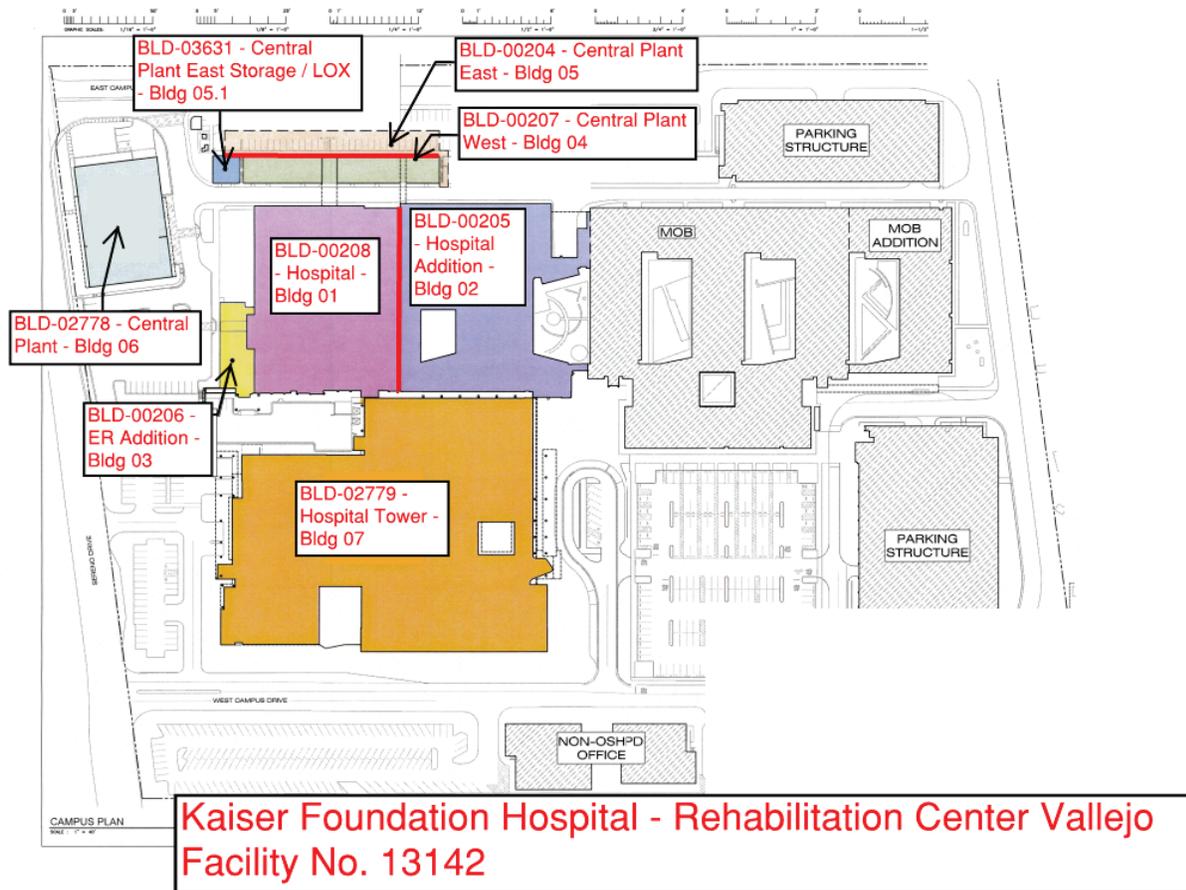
The Kaiser Foundation Hospital – Rehabilitation Center Vallejo site plan.
